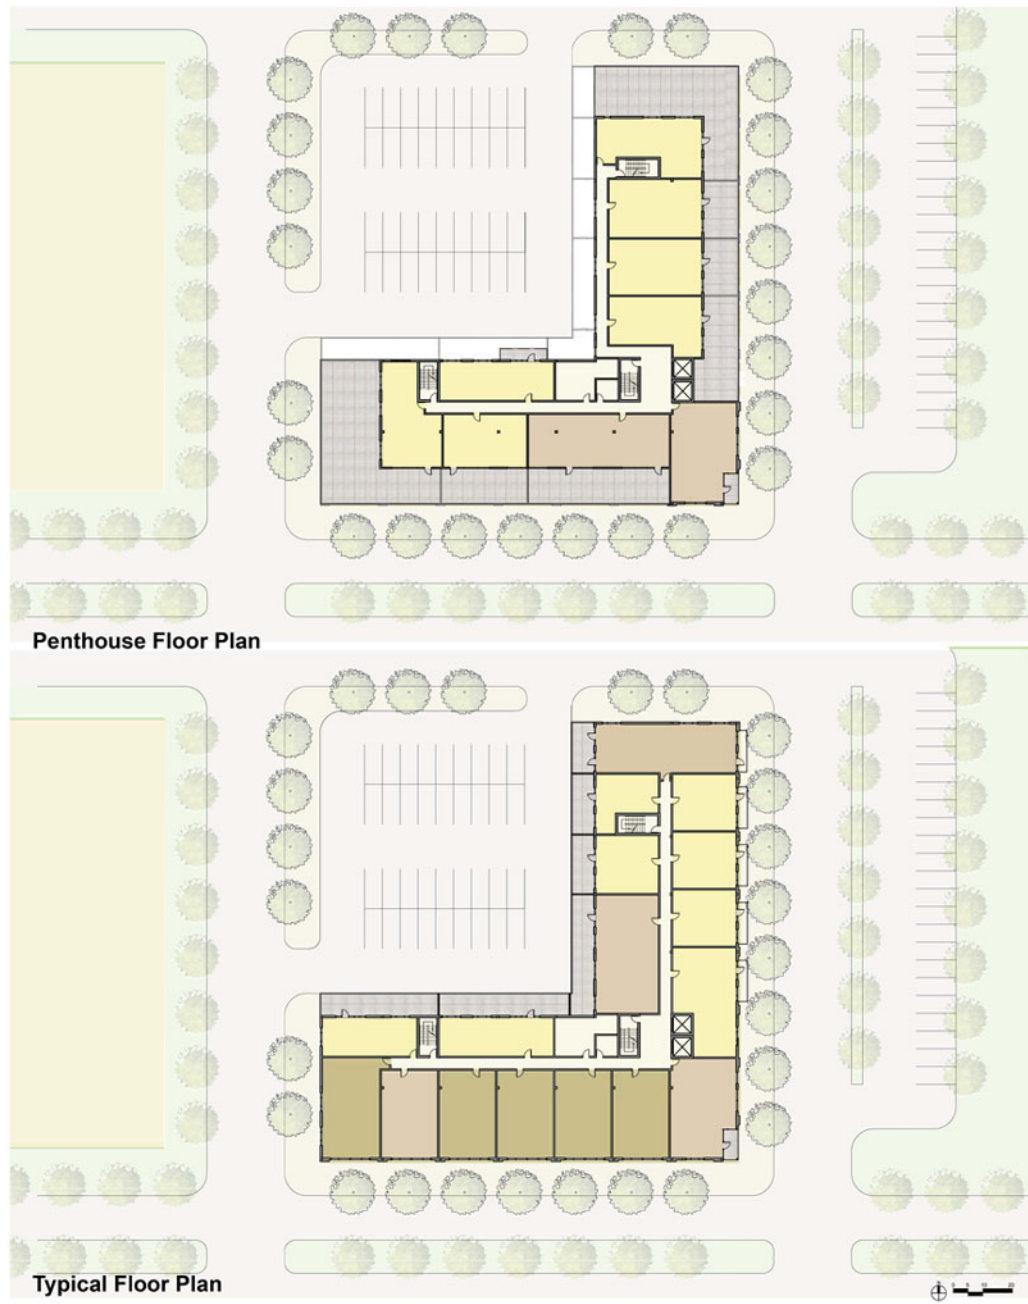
Typical Housing Floor and Penthouse Plan of Mixed Use Building on Edmondson Avenue
